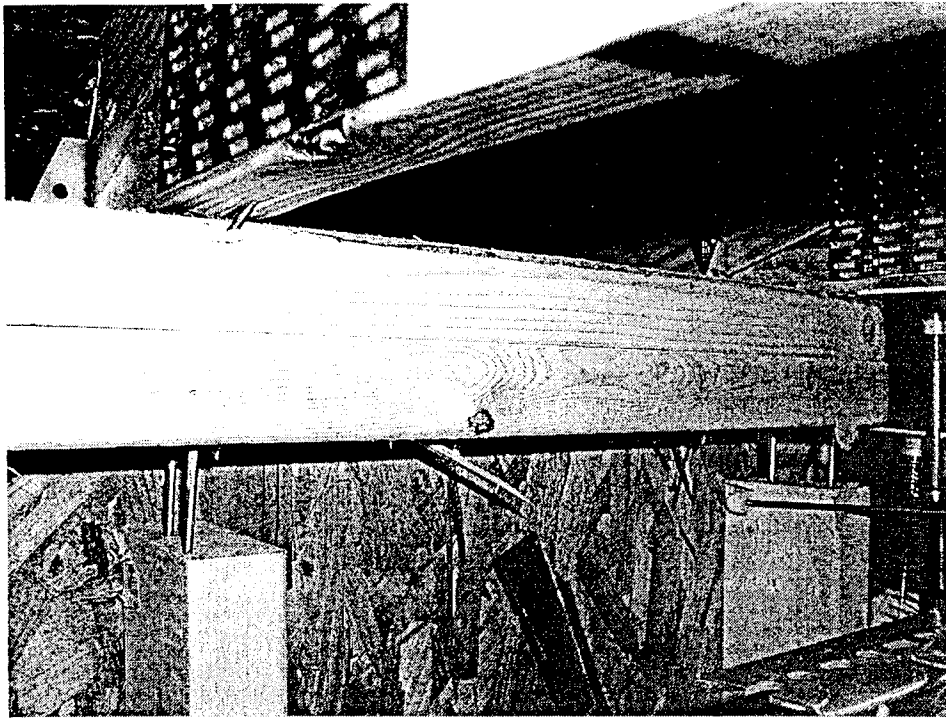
Failure of Wall-to-Roof Connection with a hurricane clip
